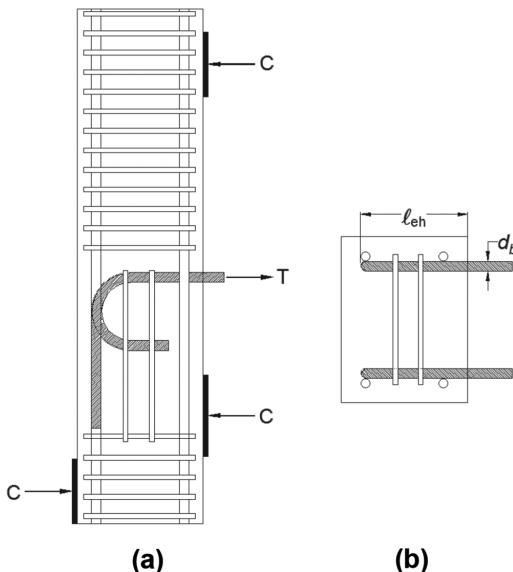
Specimen with confining reinforcement perpendicular to straight portion of hooked bar: (a) side view; and (b) cross section (Sperry et al. 2017a).
